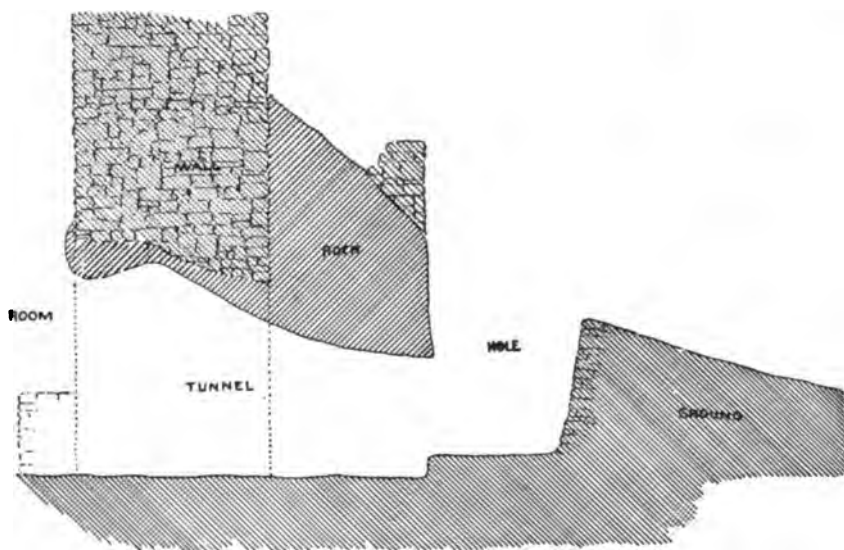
Section of chimney-like structure in ruin No. 15.
